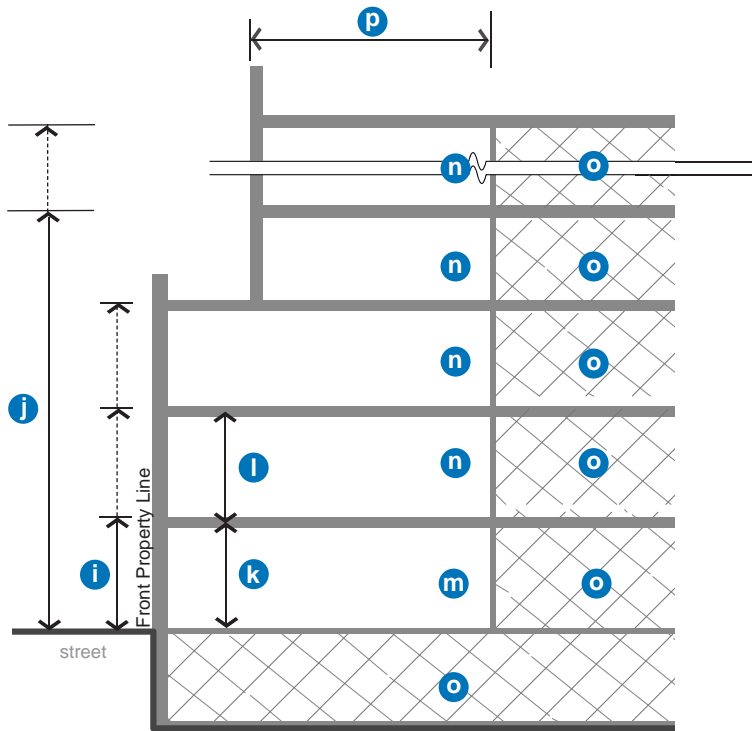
(2) Storefront Building: Height and Use Requirements
